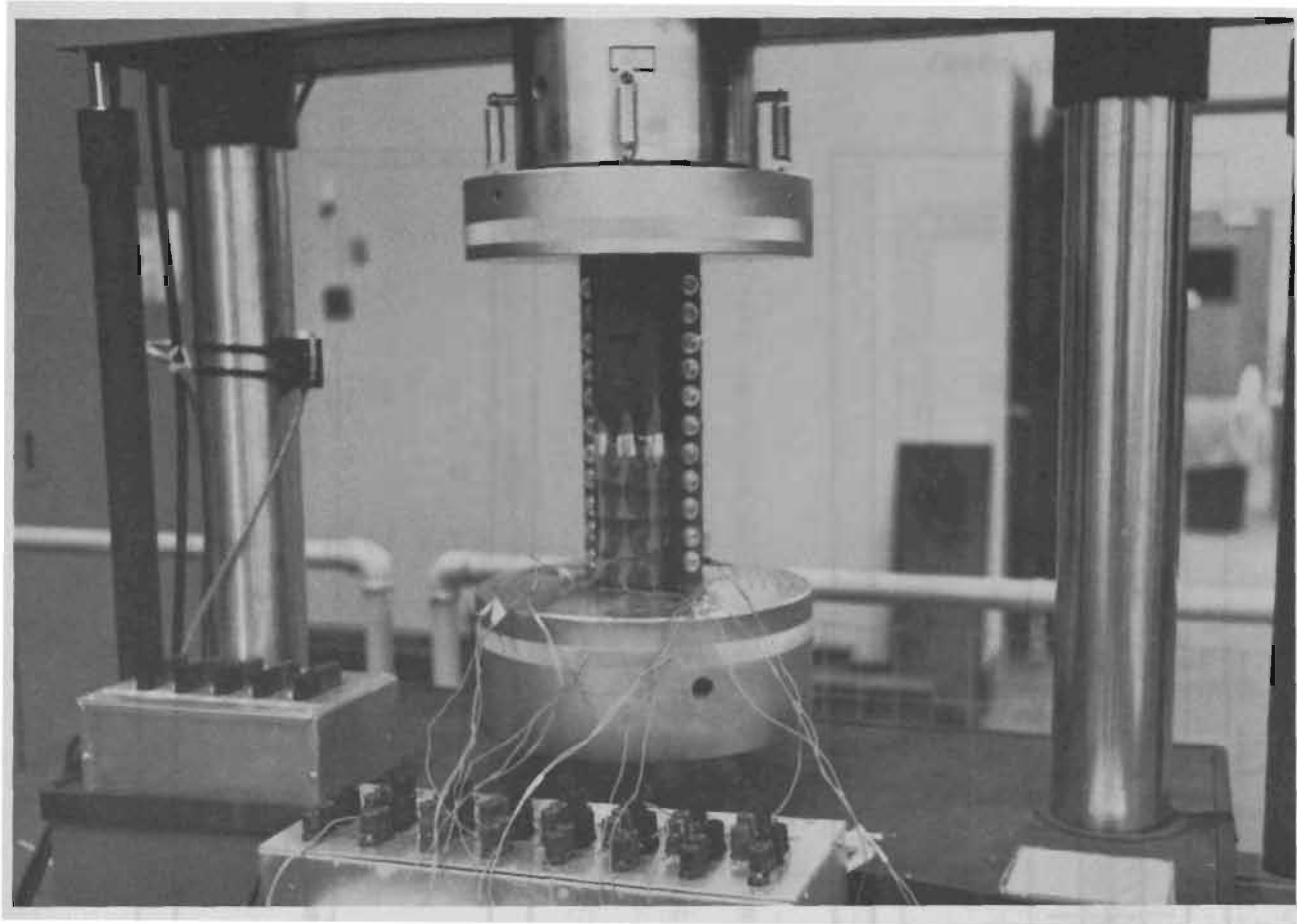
Test Setup of Stub Columns with Stiffened Flanges
